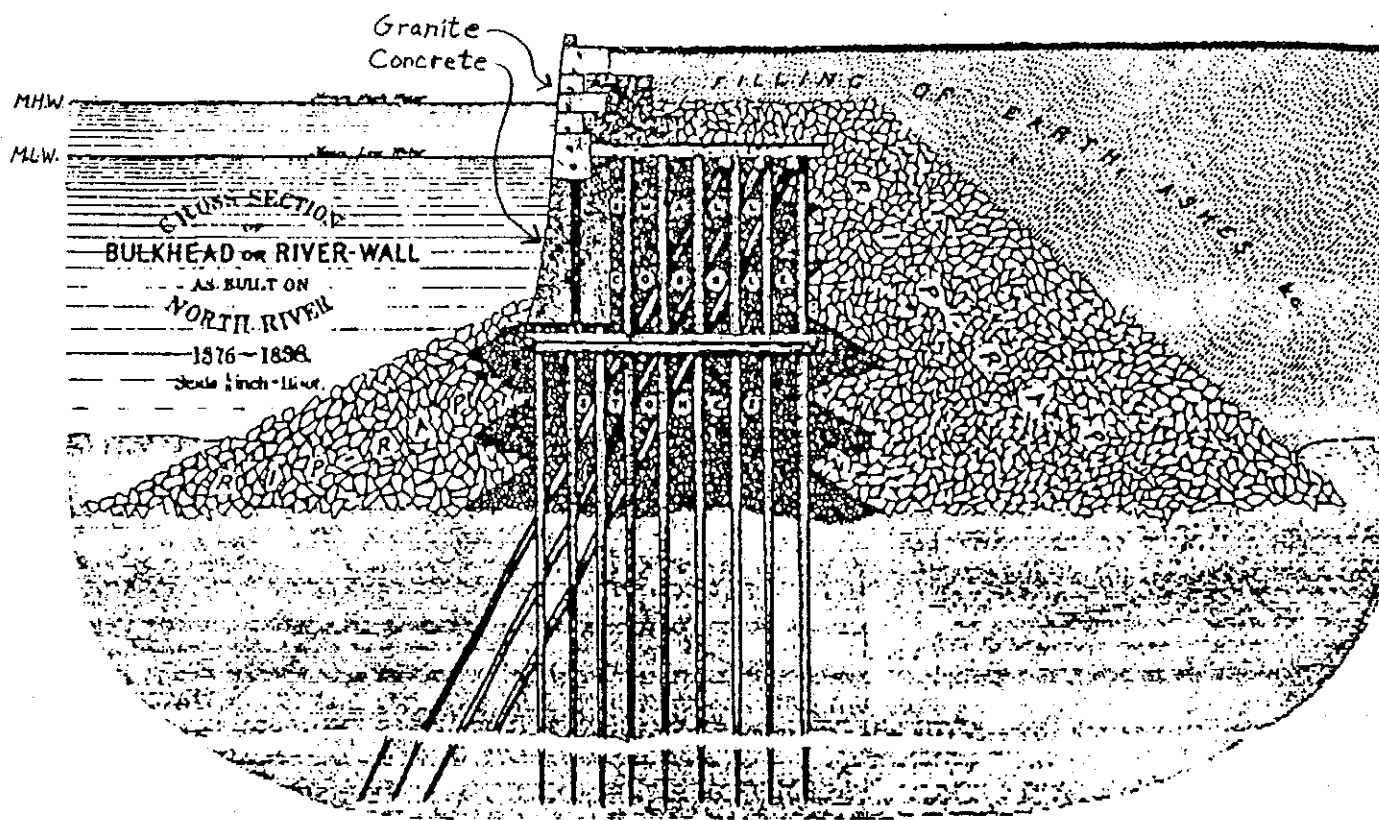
TYPICAL MASONRY RIVER WALL SECTION, AS BUILT AT WEST 55th AND 56th STREETS
